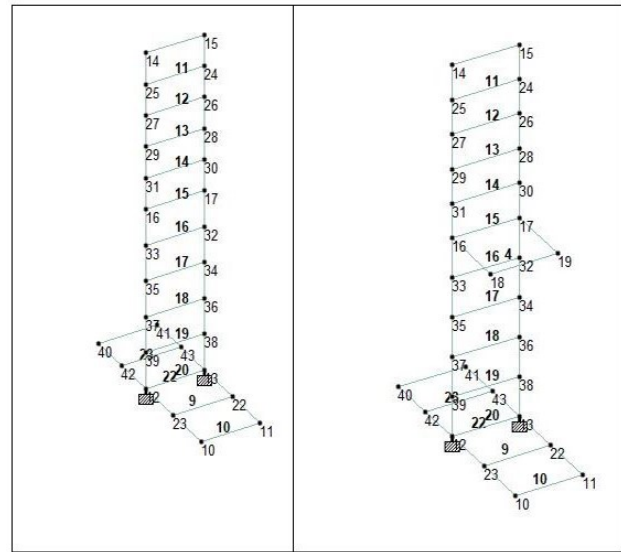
Node and plates of RCC cantilever retaining wall with and without shelf
